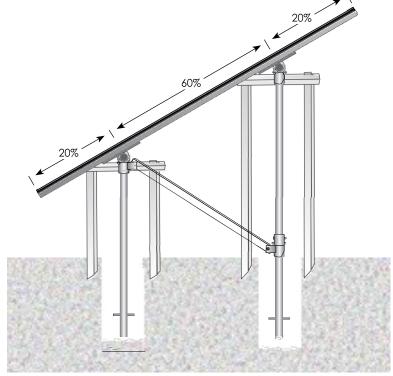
FULL-TRUSS OPTION. Footing holes should extend below the frost line. You may elect to use a few inches of gravel at the base of the holes to promote drainage. Loosely assemble the full truss structure, using wood supports to stabilize vertical and horizontal pipes. When cross braces and rails are in place, square up the array and tighten fastensers. Pour concrete after array is fully assembled, save for the modules themselves. See page 8 of this manual for installation notes.
